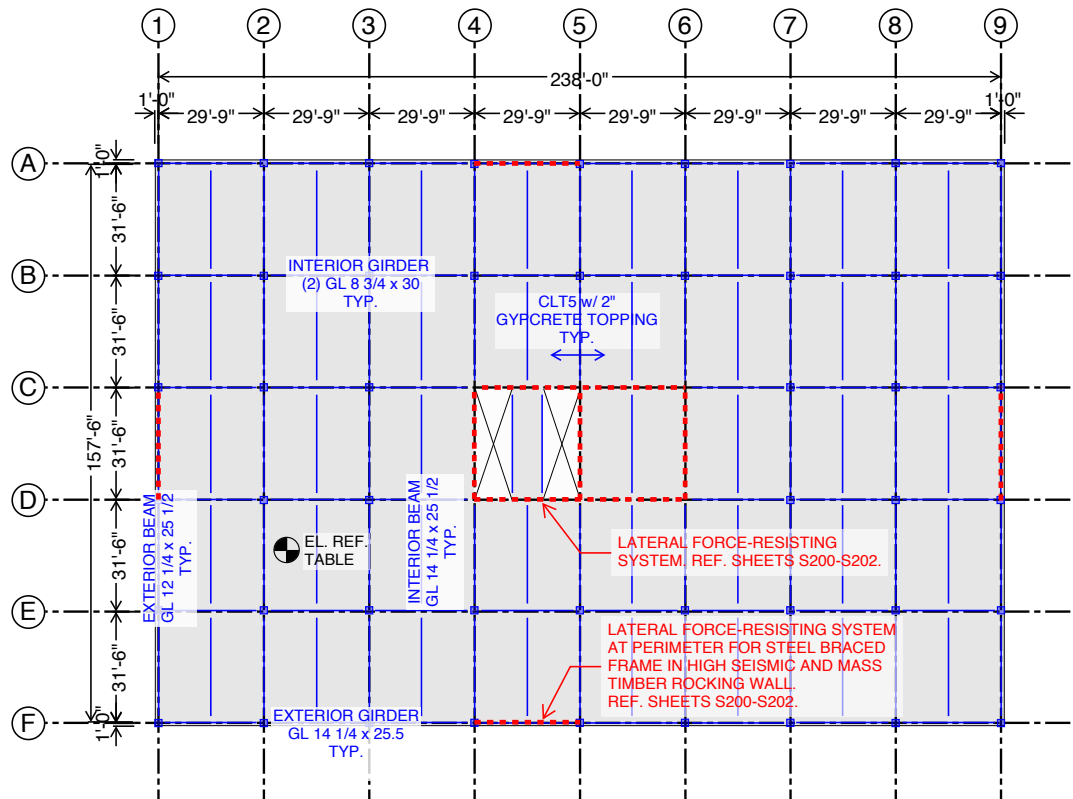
Typical upper floor plan for the large mass timber office buildings
